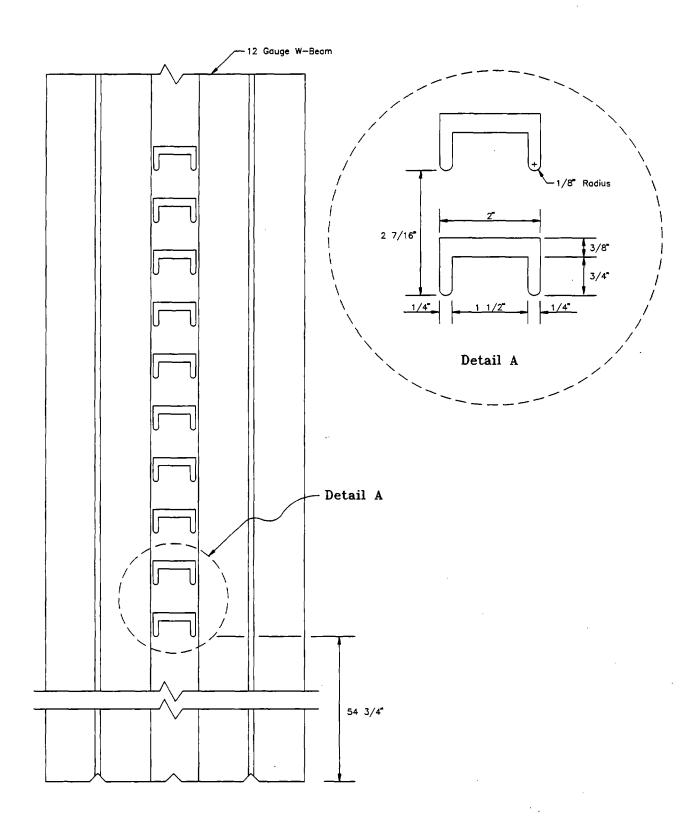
Breakaway Cable Anchor W-beam Attachment Details.
